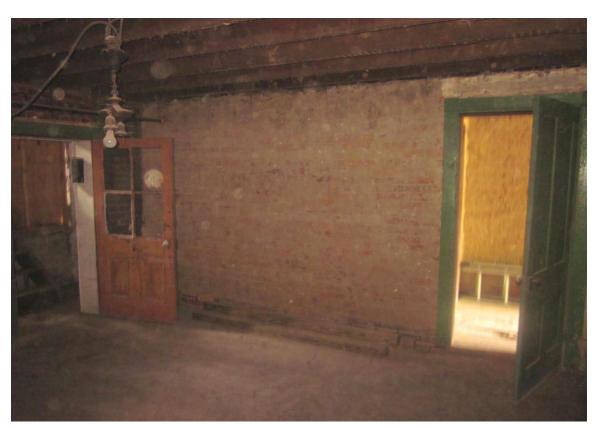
Interior Woodwork; Flooring (concrete floor); Plan (Room 1, Basement)
